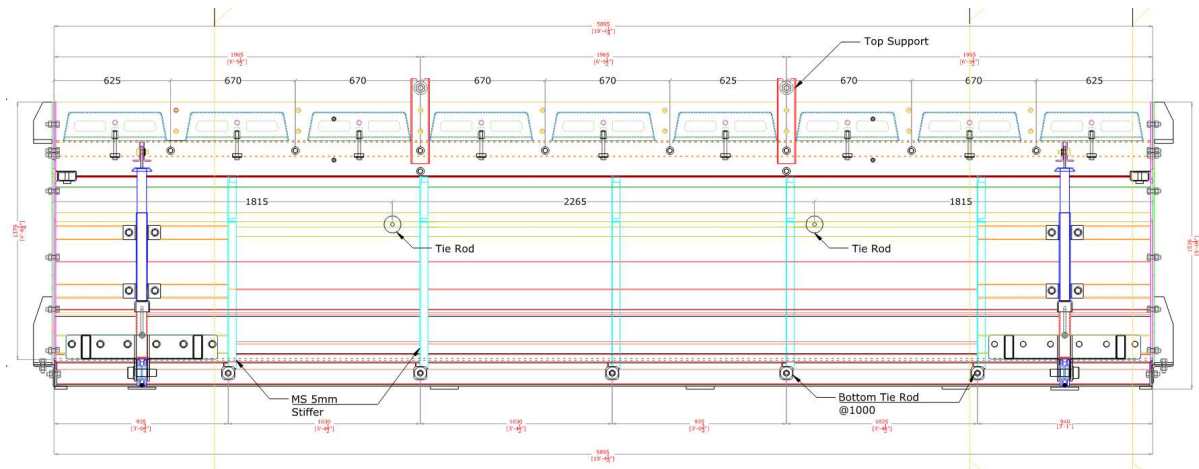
Sectional, plan, and elevation views of the DIB forms
